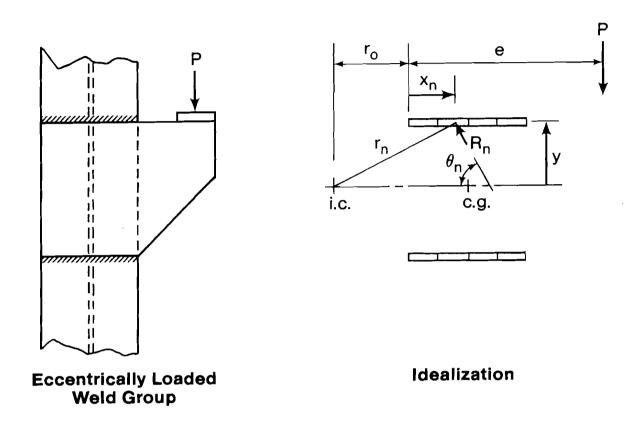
Eccentrically Loaded Weld and Idealization
